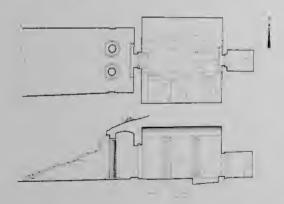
Plan and section of Khuumhotep II's tomb (After Newberry, Heni Hasan 1, pl. 22)
